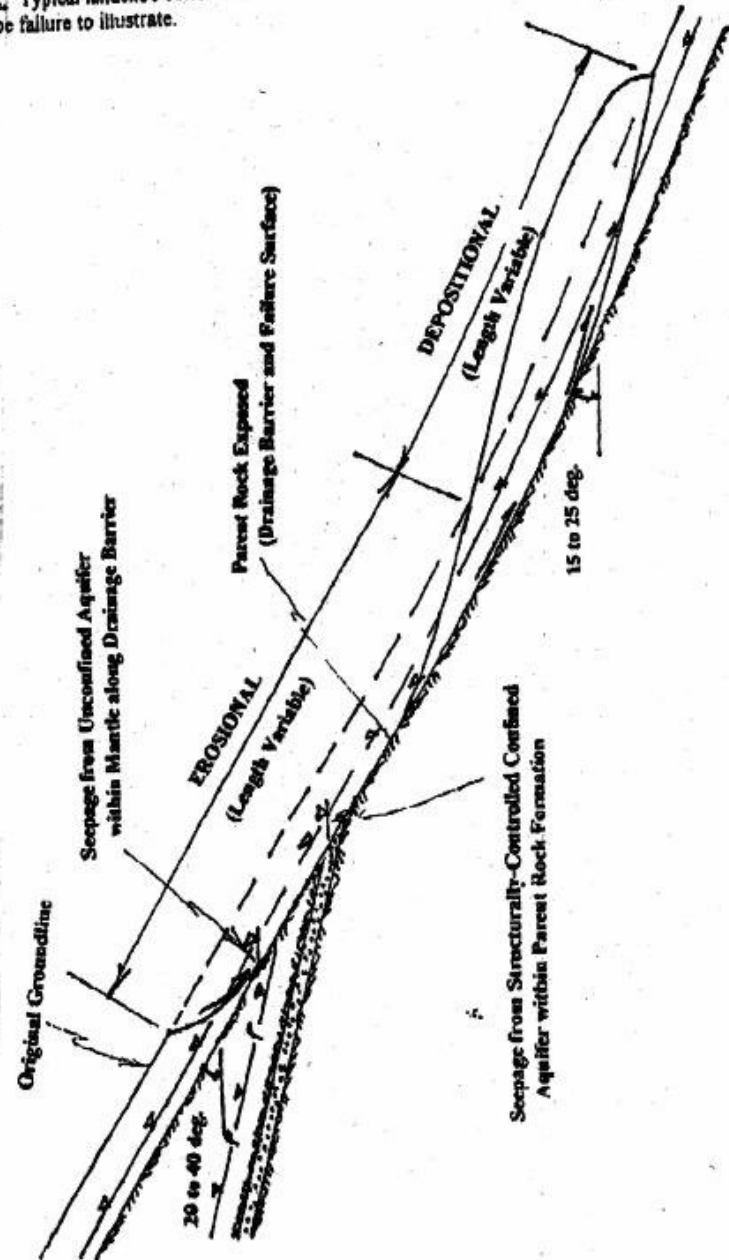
Typical landslide conditions for the Wildcat parent rock formation using road cut-and-fill slope failures to illustrate.
